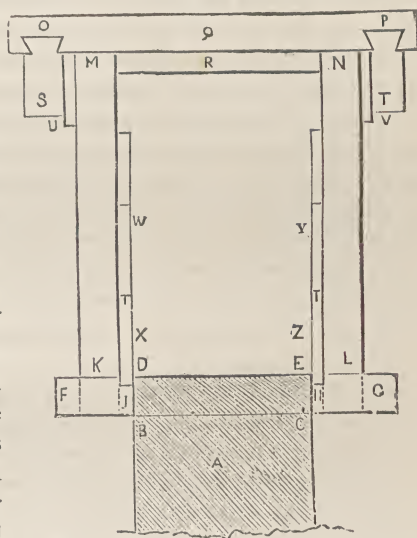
APPARATUS FOR BUILDING EARTH WALL.
